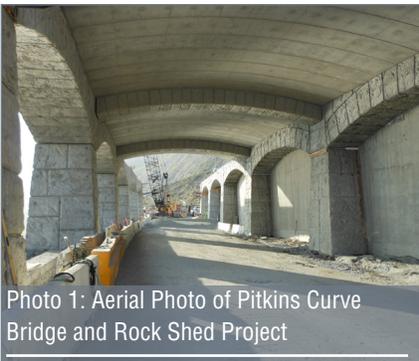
Aerial Photo of Pitkins Curve Bridge and Rock Shed Project
